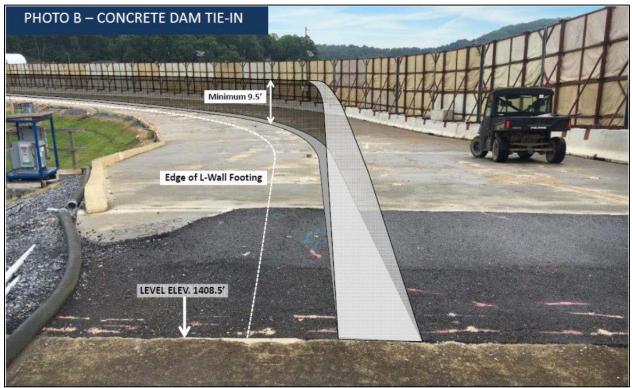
Photo illustration of the proposed floodwall height (left) and the existing construction wall (right) at the point where it will tie in with the concrete dam.
